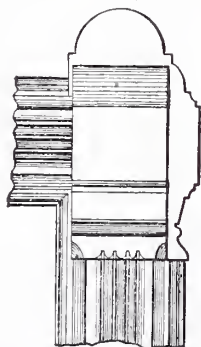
Face View of Corner of Inside Casing and Bracket to be Used in Place of Corner Block. Rosette to be Used on Square.
